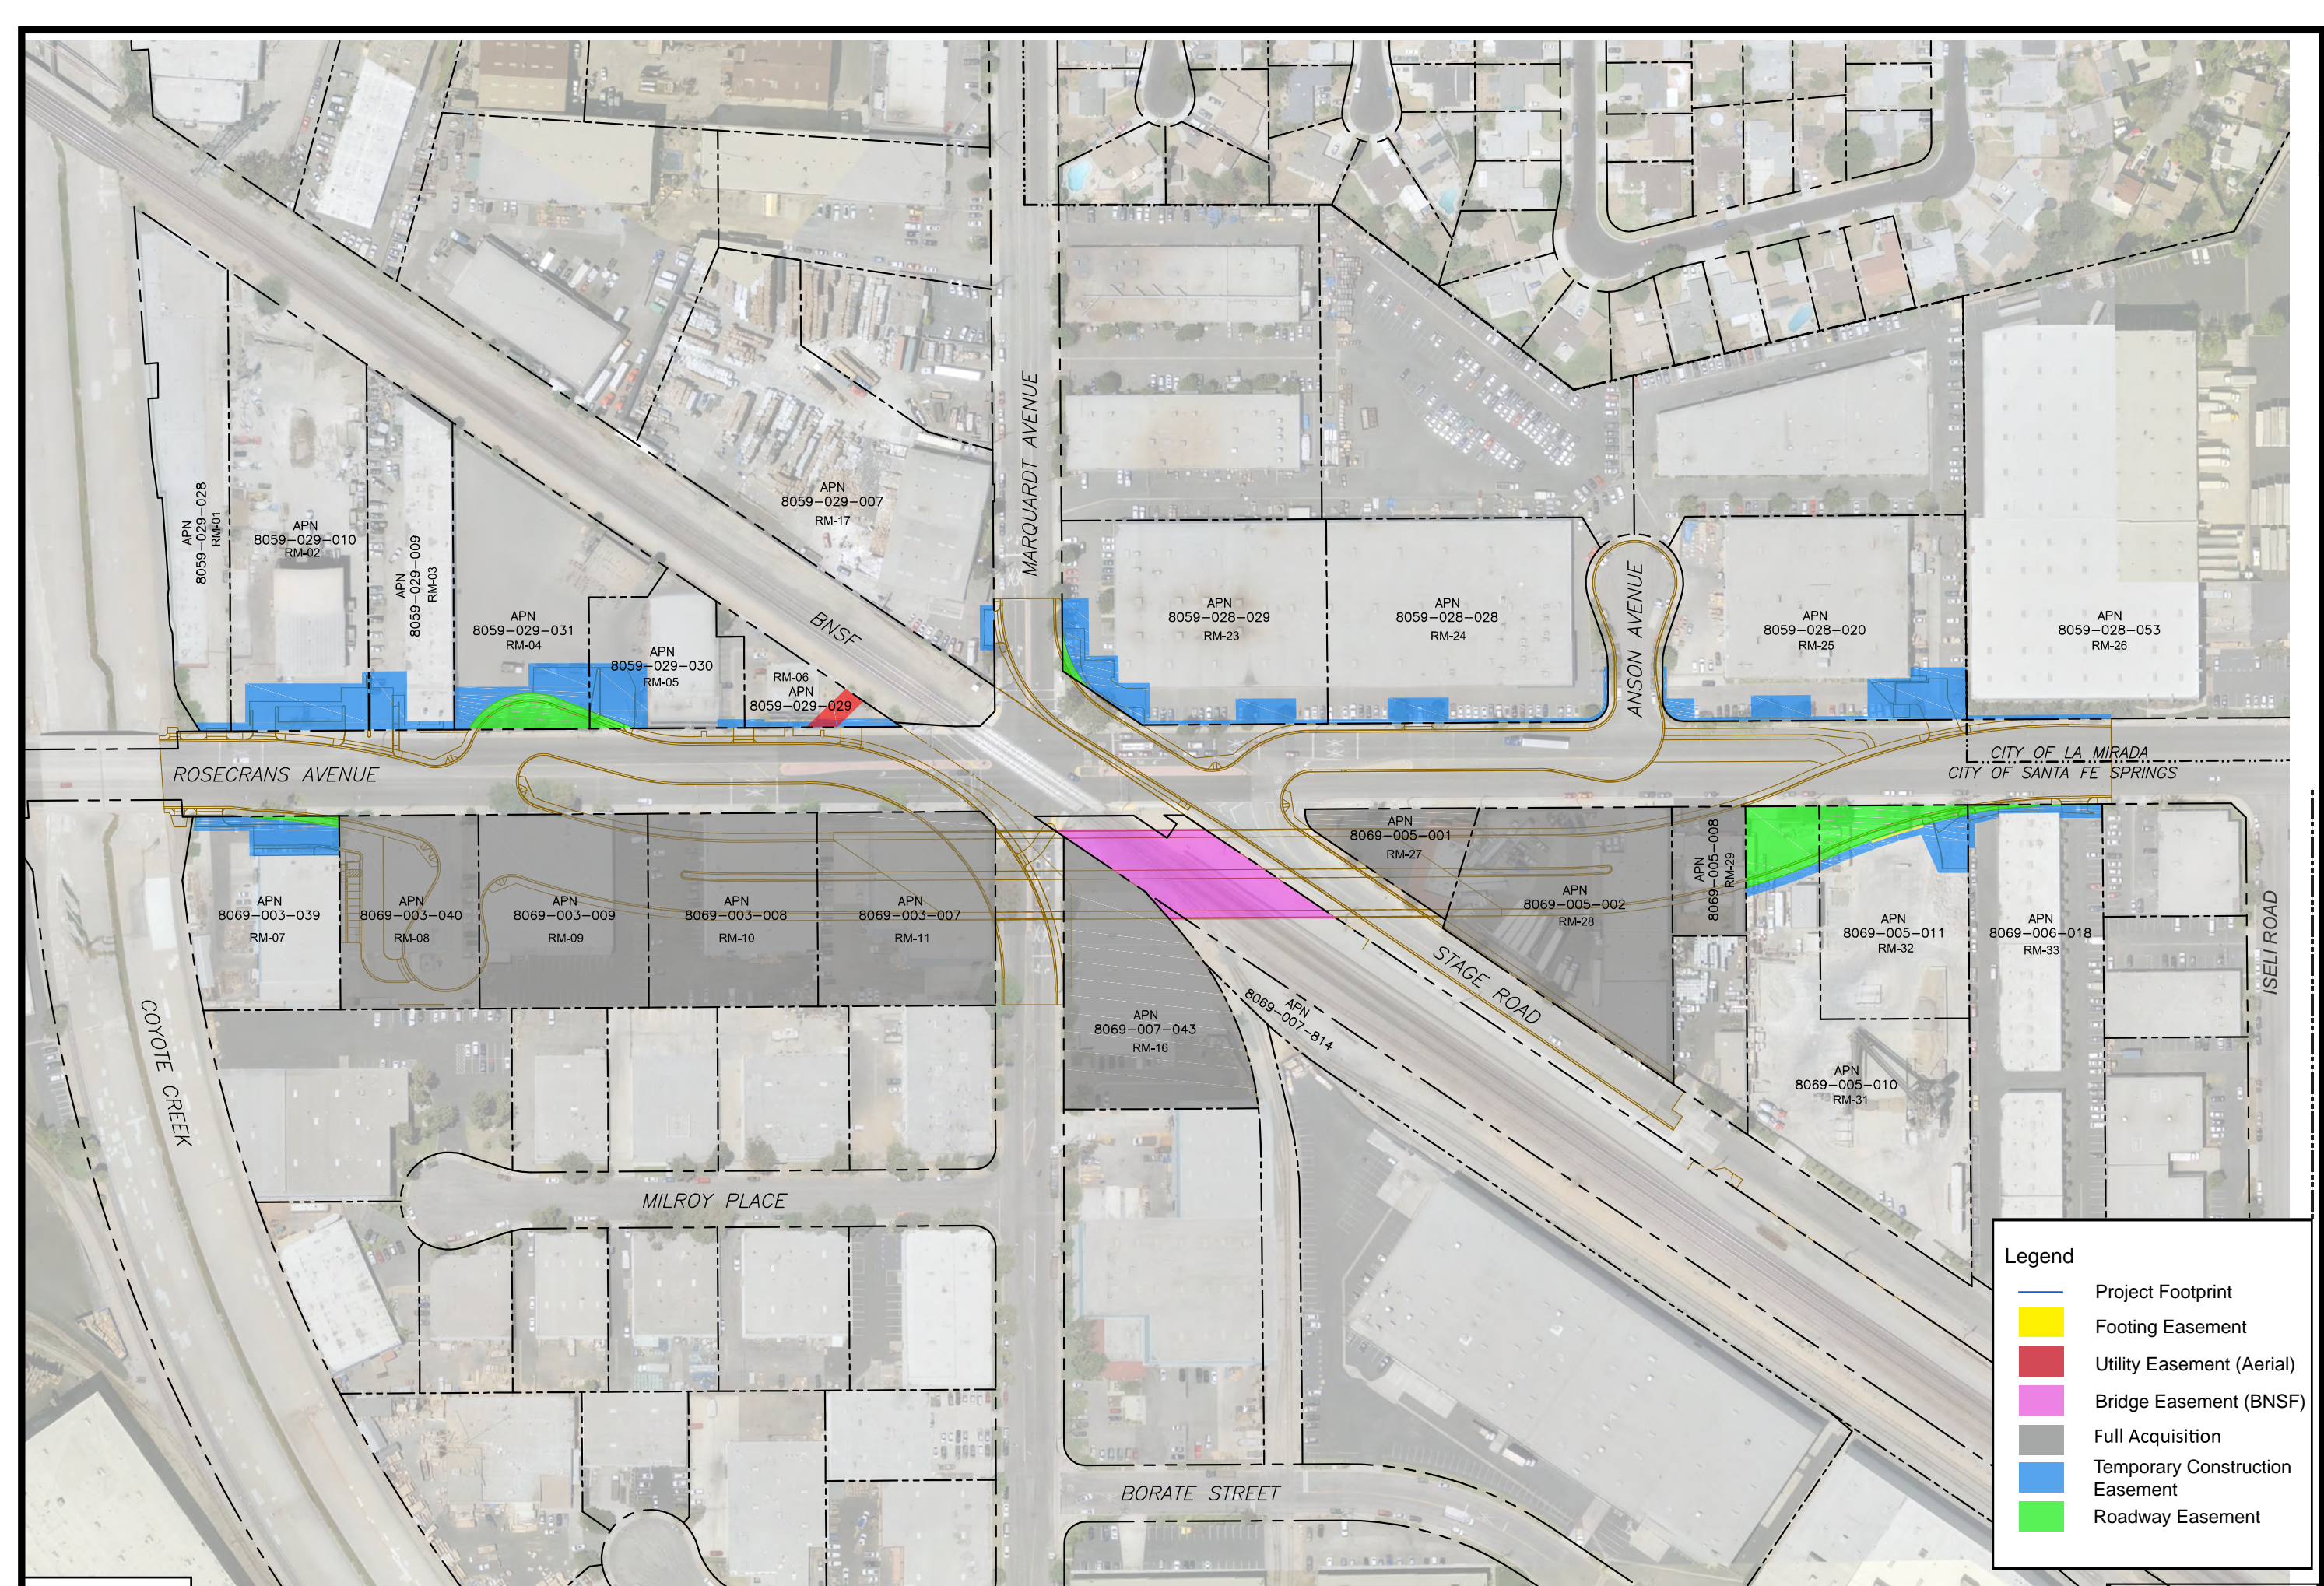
ALTERNATIVE 2-PLAN VIEW
